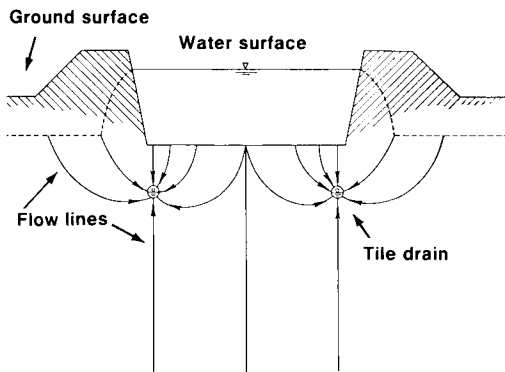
Proposed evaporation pond design in which drain tiles are placed beneath the pond instead of at the perimeter. Schematic shows calculated flow lines, which would intercept seepage through bed material and recirculate it to pond surface.
